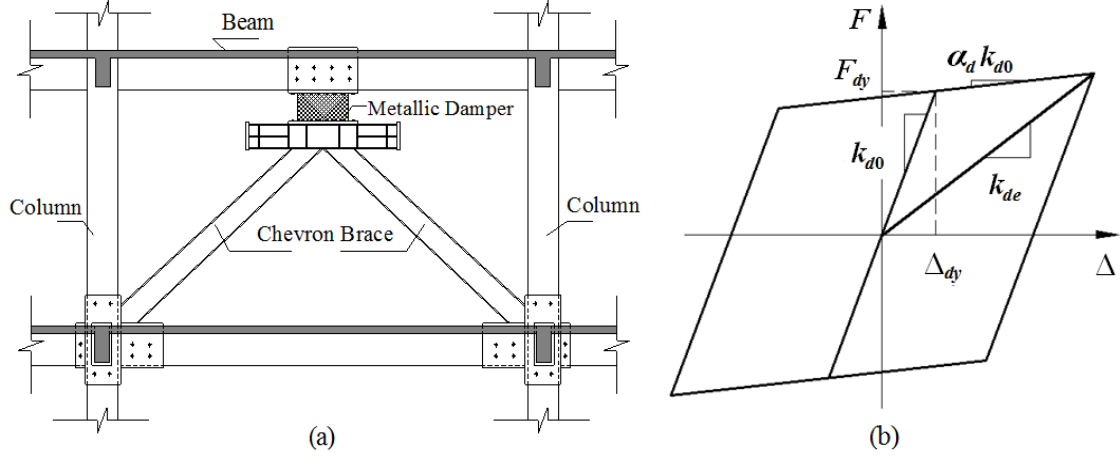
Metallic damper with chevron brace, (a) typical configuration, (b) bilinear hysteretic model
